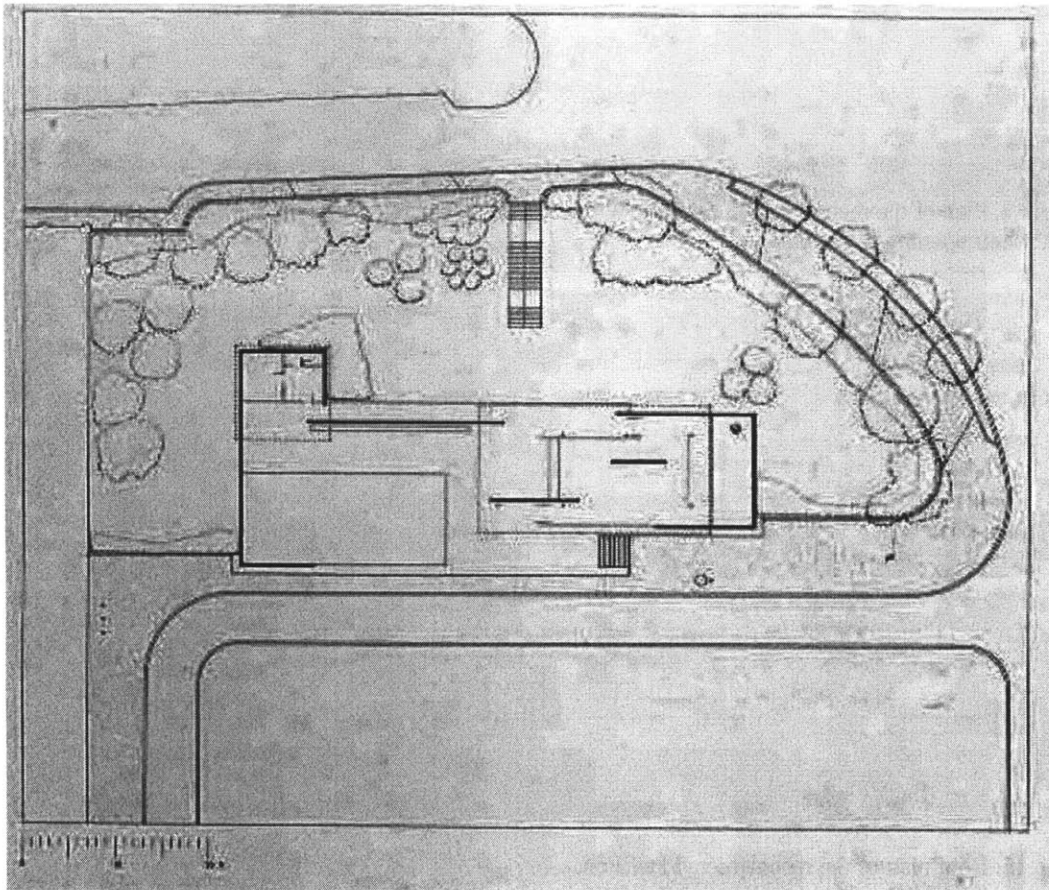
General plan of the reconstructed Pavilion with the surroundings.
